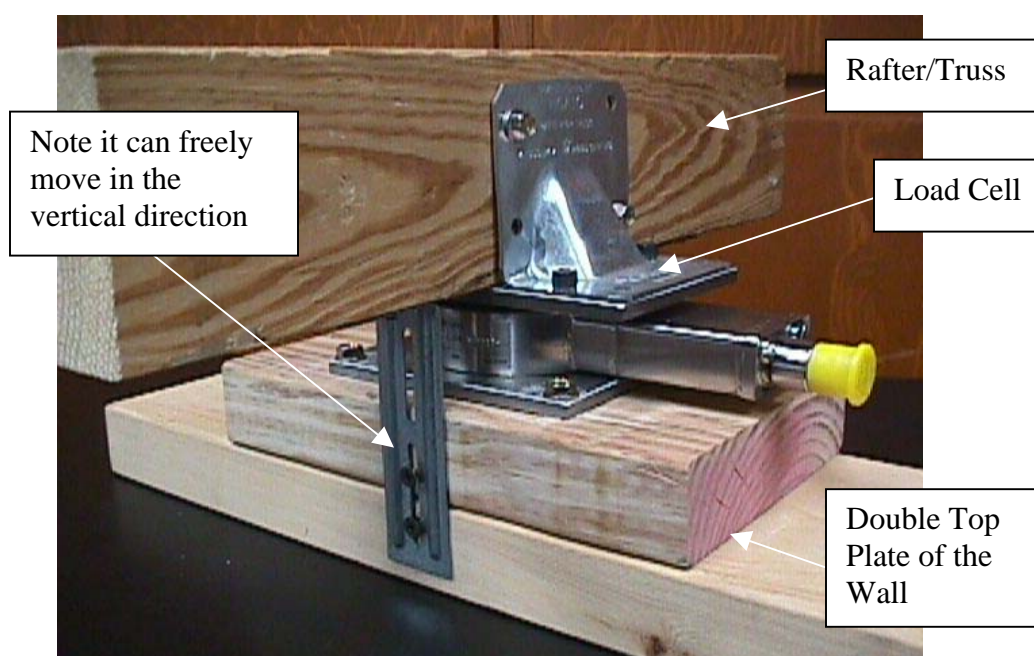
Illustration of load cells placed between the roof and wall under each rafter/truss [FPL, 2006]
